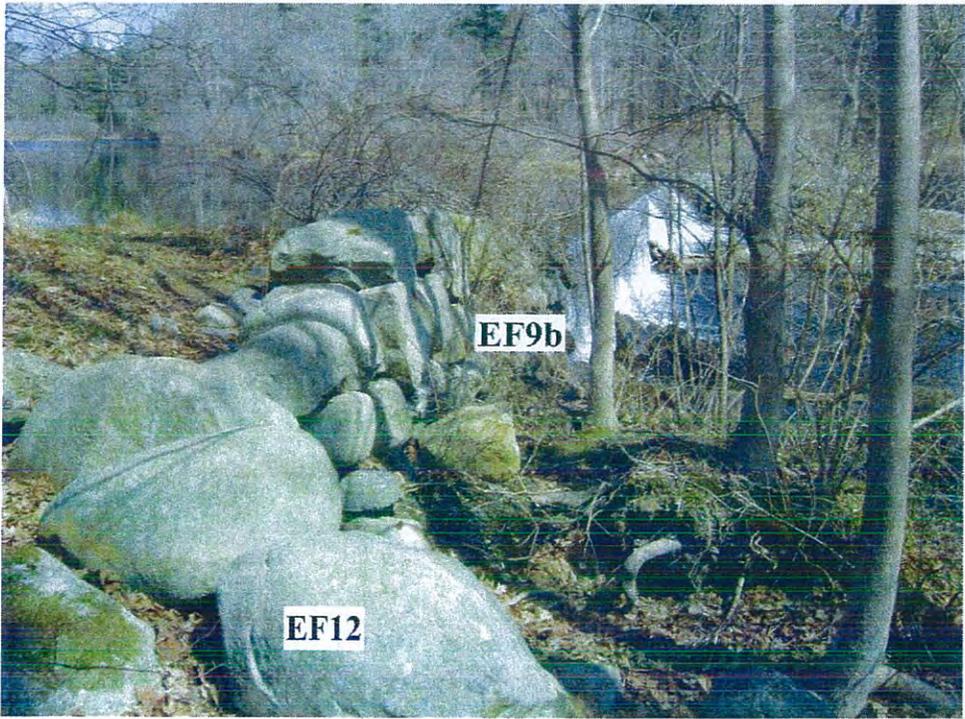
Looking easterly at dam from location of stone wall (EF12) and stone abutment (EF9)
